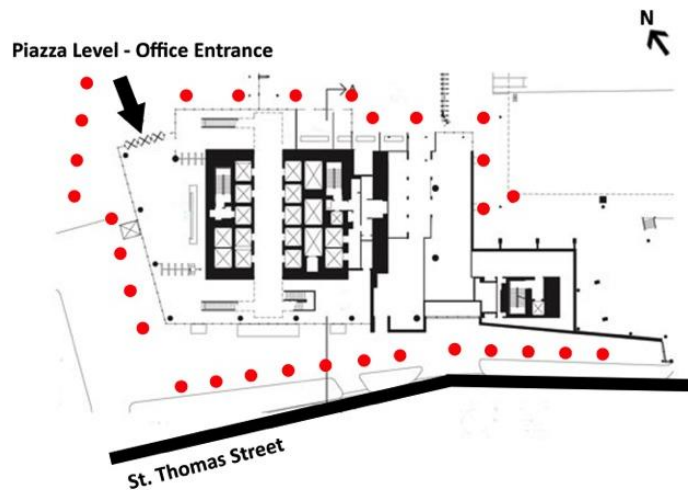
Exterior colonnade design plan of The Shard (Adapted and Re-drawn; www.designalmic.com) Figure is not scaled
